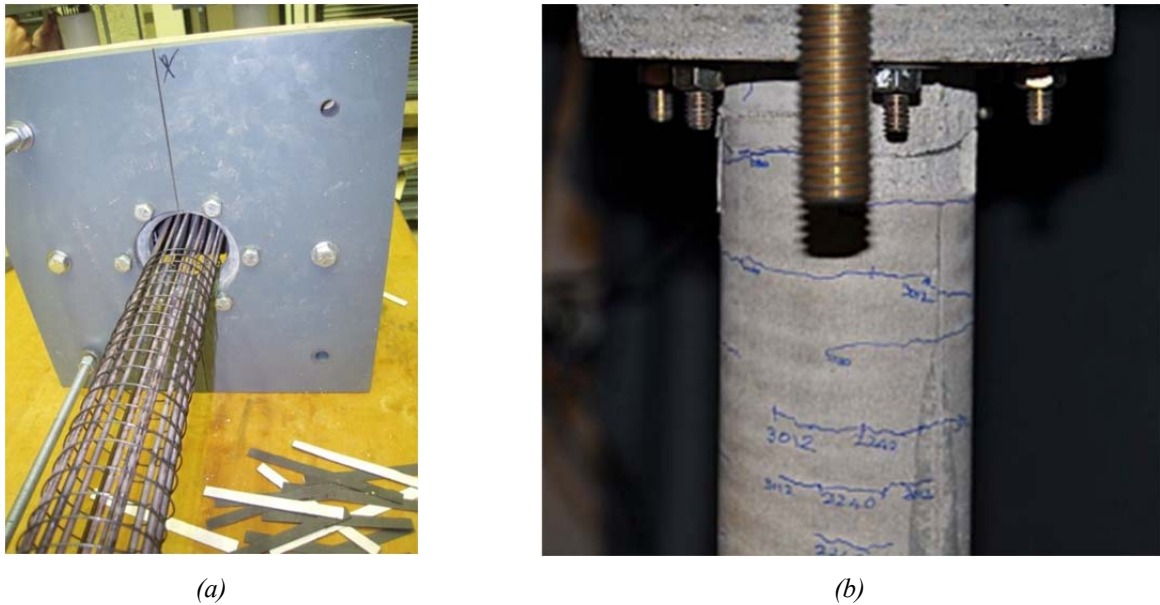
a) Reinforcement cage and cap formwork b) Small-scale flexural cracks
